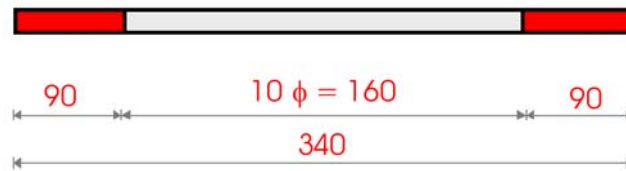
Geometrical data of the specimens for the cyclic loading tests (dimensions in mm).
